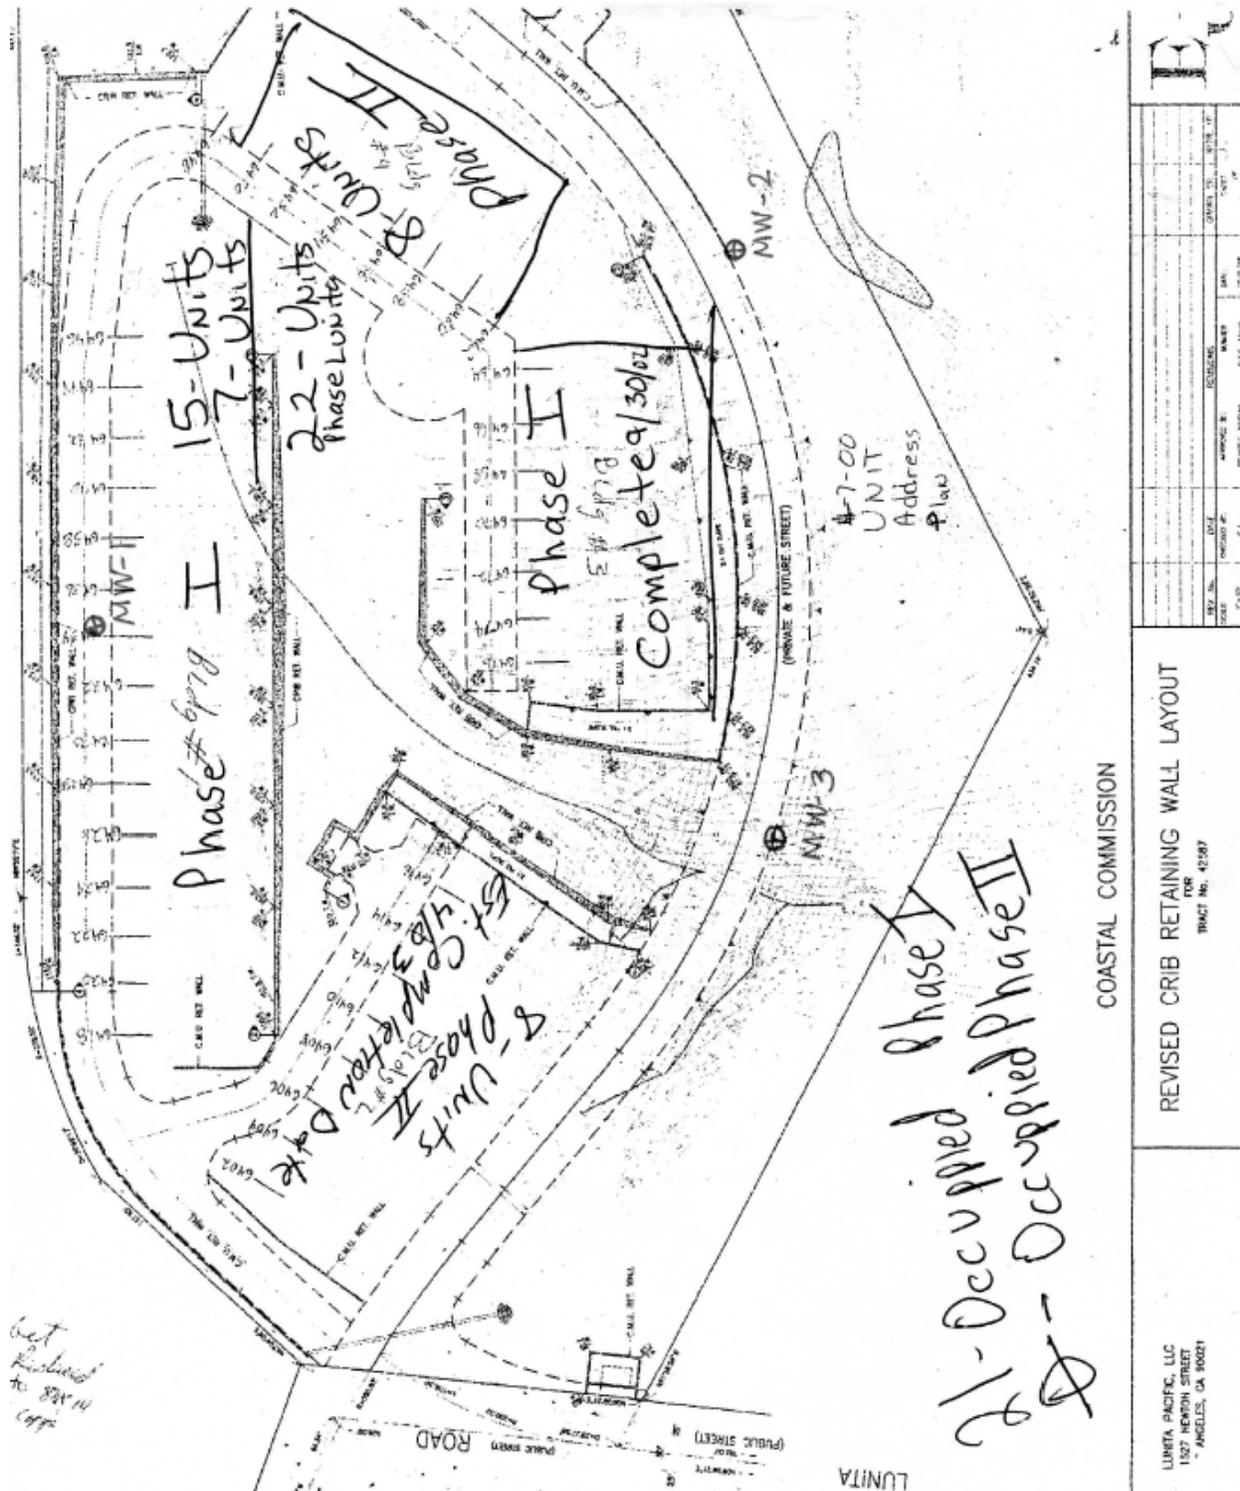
Existing Groundwater Monitoring Well Locations MW-1, MW-2, and MW-3
